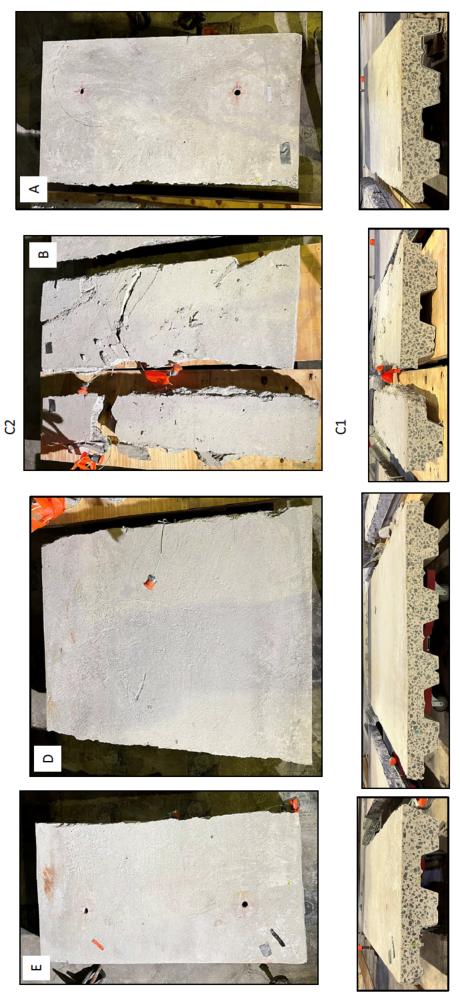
Slab 4 pieces positioned in a manner in which they were located in the slab prior to fracture. (a) Top view and view of the south cut face.
